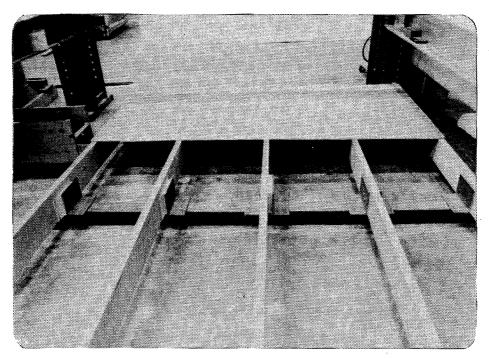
Concentrated Load Test Panel nailed in place on the joists.
